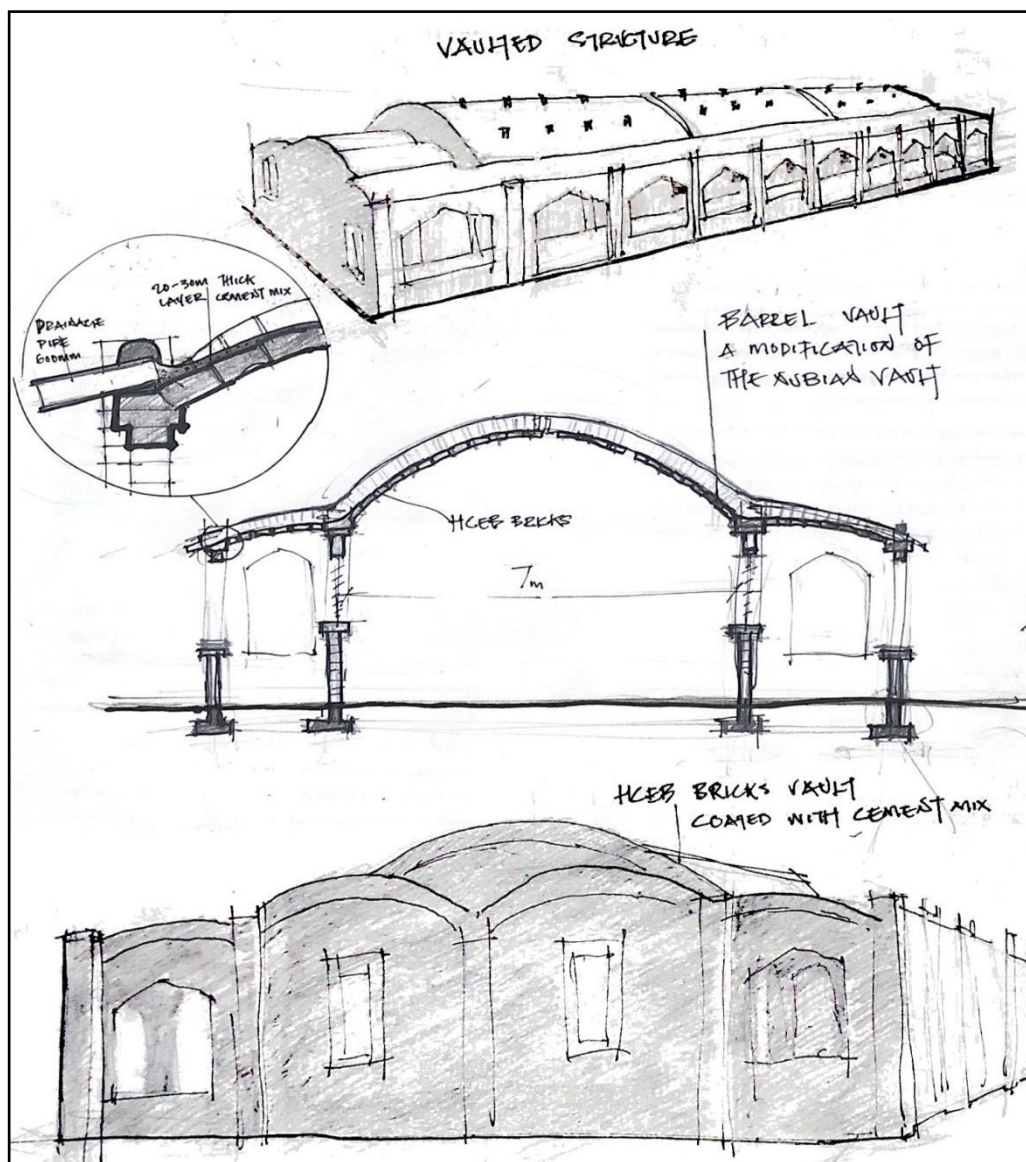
Primary School Tanouan Ibi, Mali Section and Sketches
